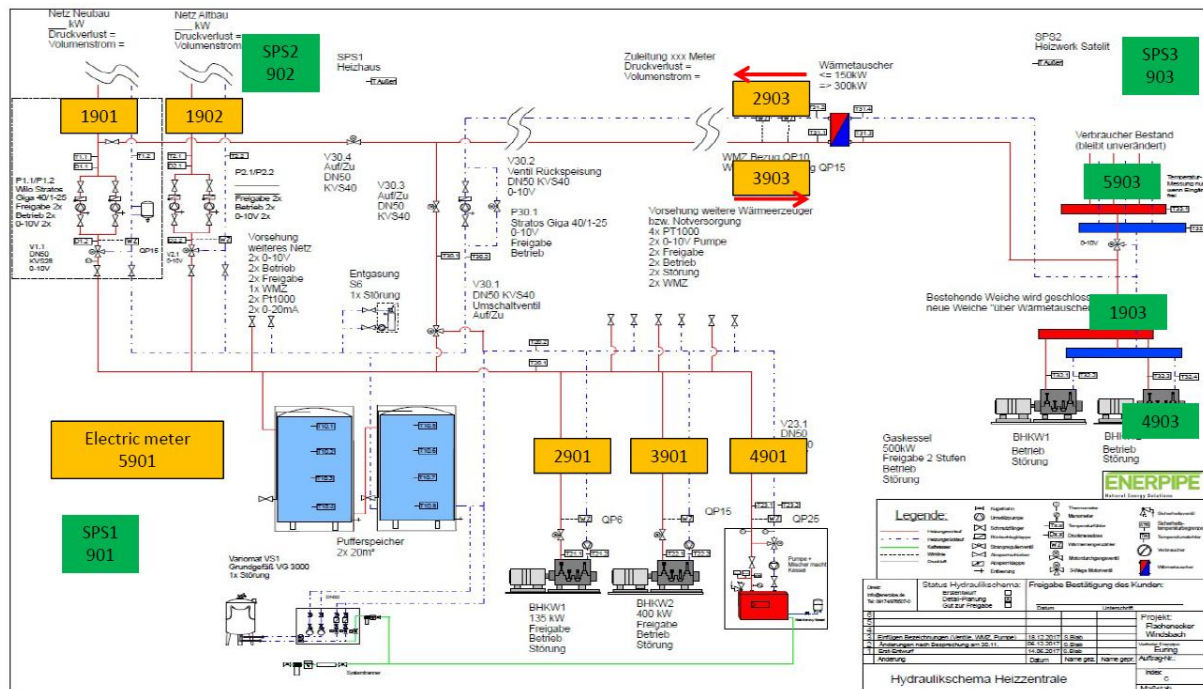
hydraulic concept and monitoring concept of the central heating plant
